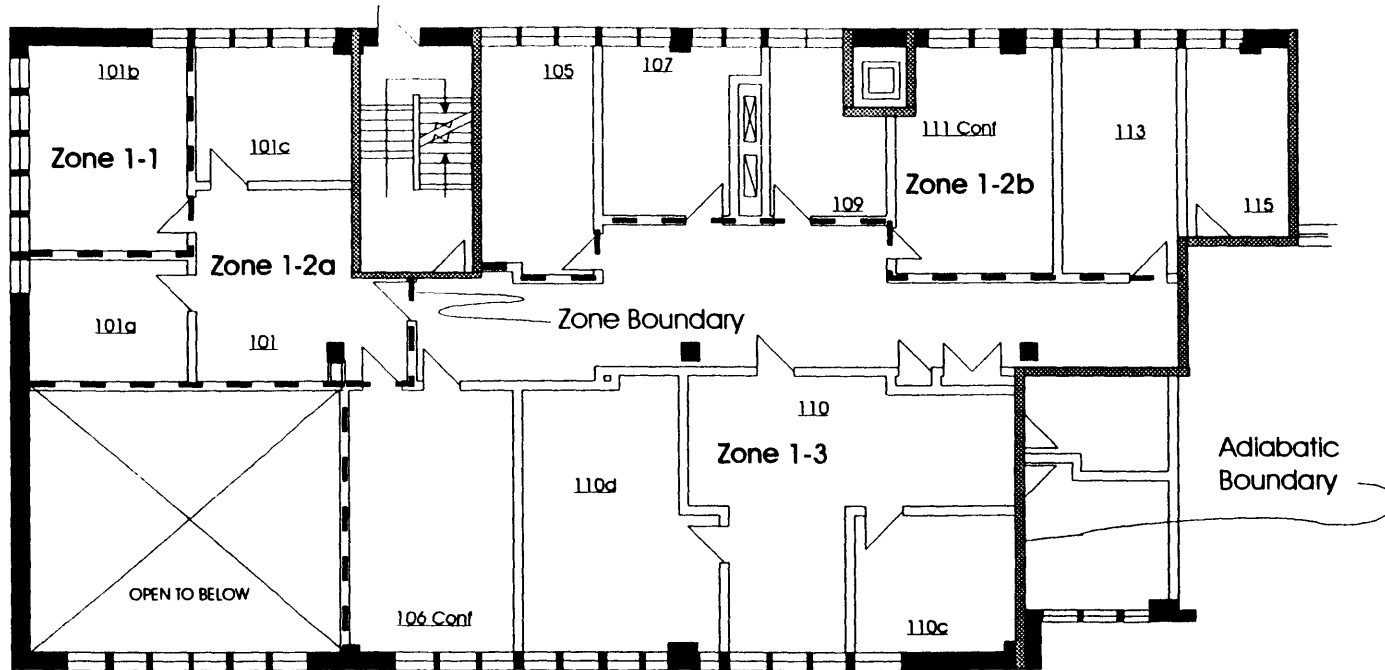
Building E51 - First Floor Level Zoning Option 1B
